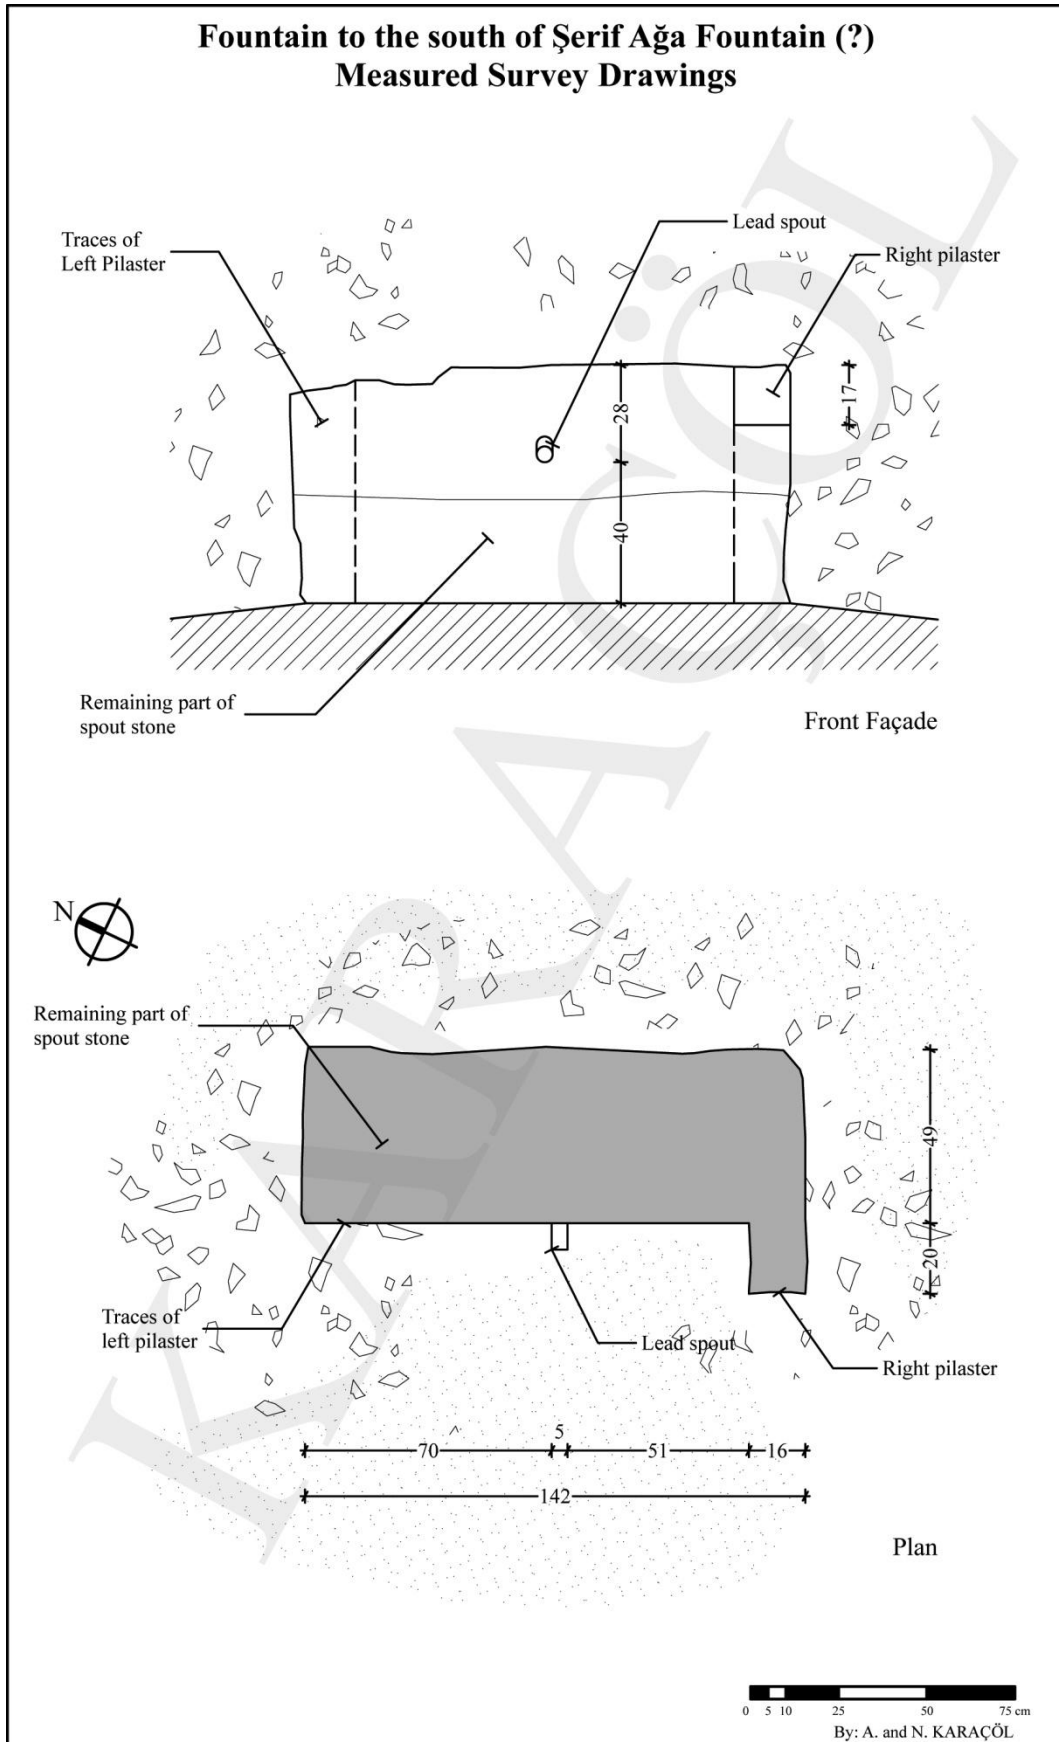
Fountain to the south of the Şerif Ağa Fountain front façade and plan drawings
